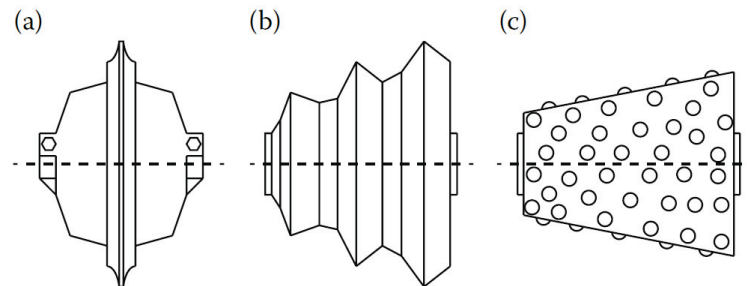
Common types of roller tools: (a) Single-disc cutter, (b) Multi-disc cutter and (c) Strawberry cutter. [24]
